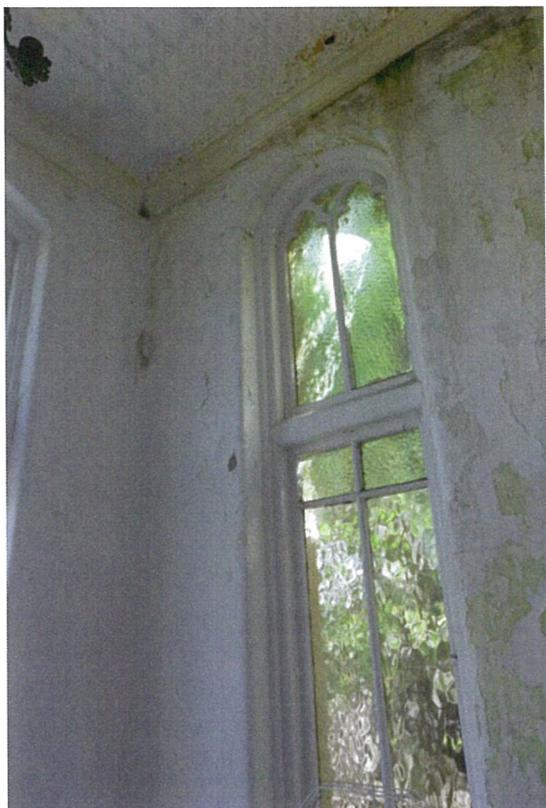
Extensive water damage, cracking around south window, southern porch.
